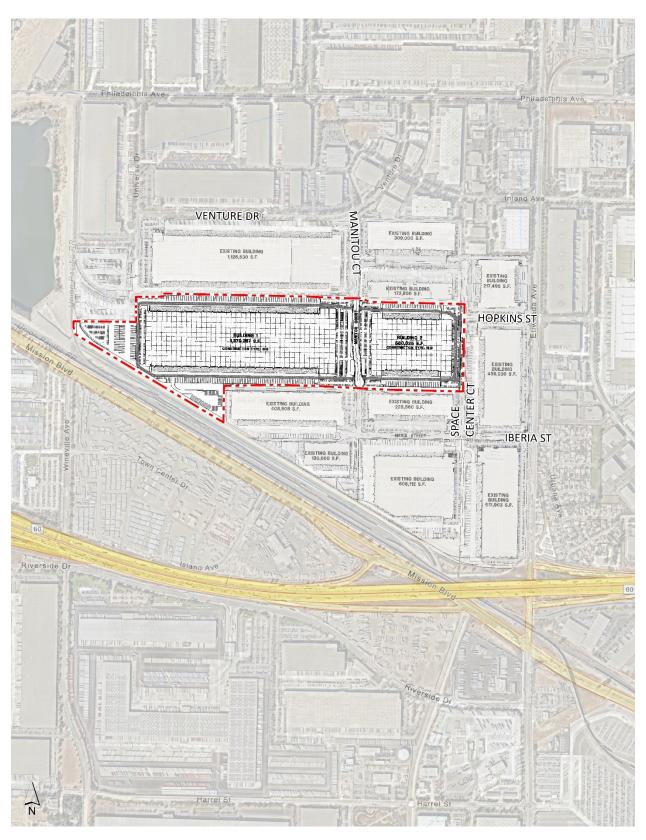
PRELIMINARY SITE PLAN
